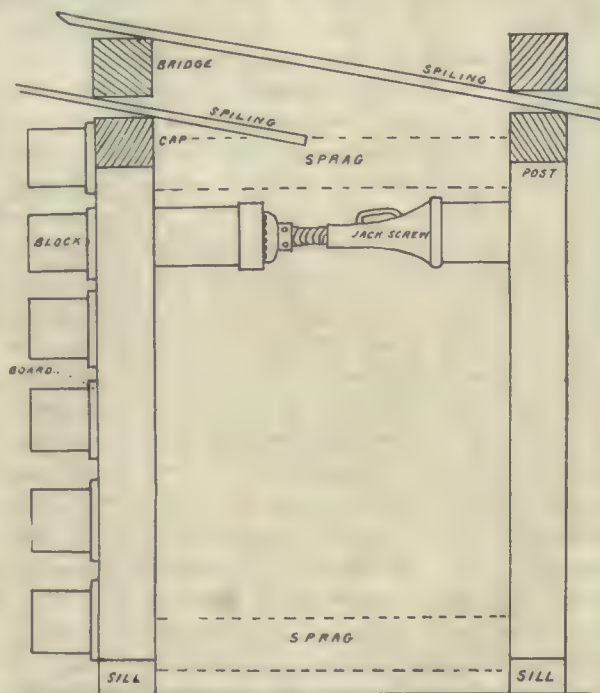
Arrangement of Jack-Screws and Lagging in Soft Ground.
